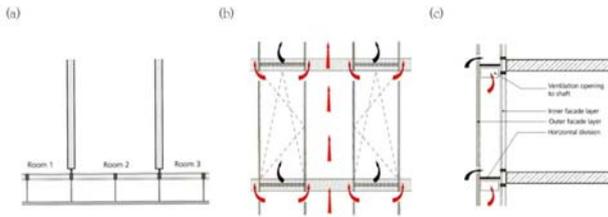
Shaft box facade: Plan (a), section (b) and elevation(c) (Osterle, 2001)
